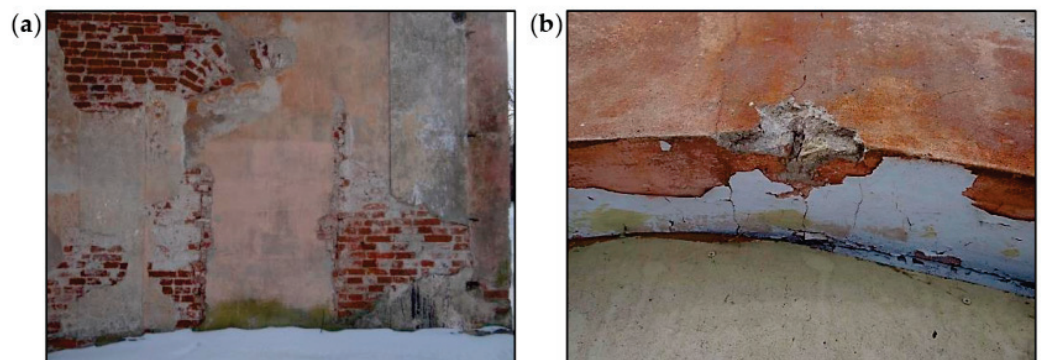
Damage to external walls: (a) plaster losses and bricked-up door opening and (b) crack in the arch above the window.
